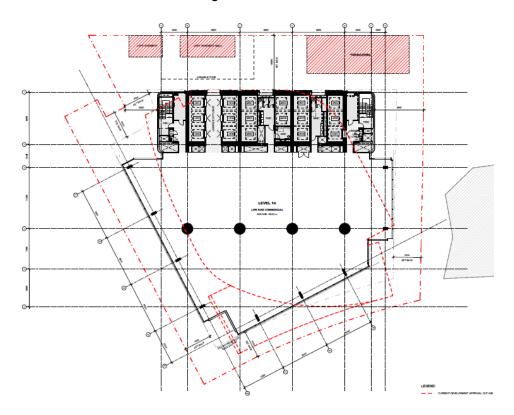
C - Typical tower level plan (source: application plans prepared by Grimshaw Architects)
